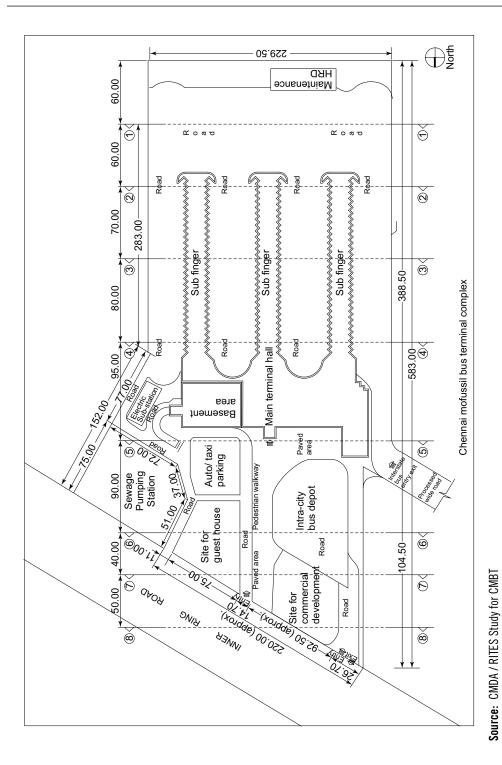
Chennai Mofussil Bus Terminus—Layout Plan
